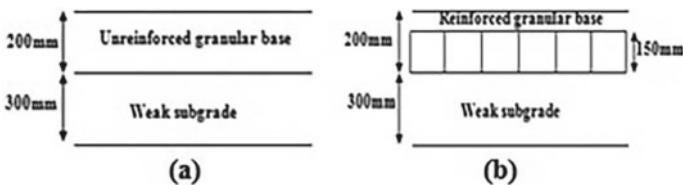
Typical pavement section. a Unreinforced. b Reinforced
